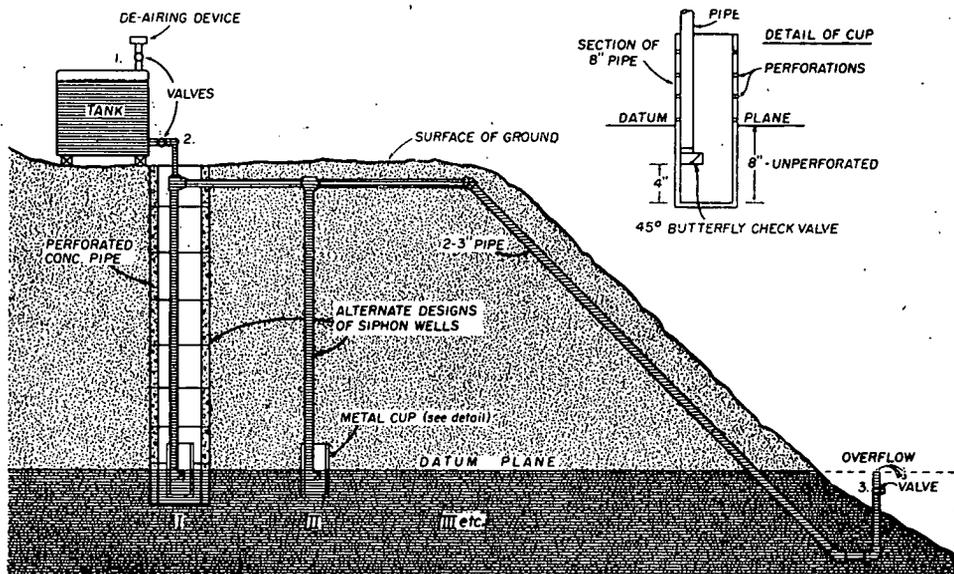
The Washington siphon. This system of vertical collector pipes and siphon arrangement has been successfully used by the State Highway Commission of Washington for lowering the water level and stabilizing landslides.
